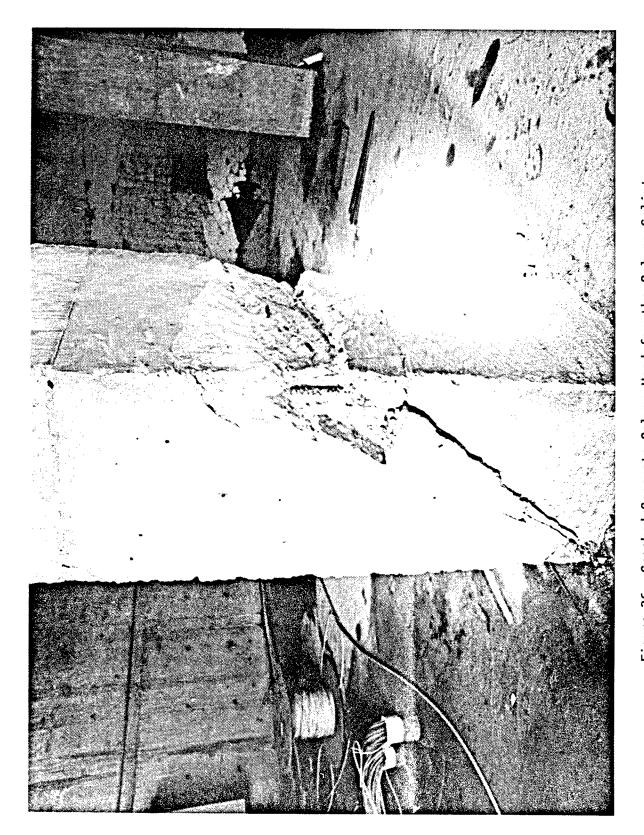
Cracked Concrete Column Used for the Column Splint Field Demonstration.
